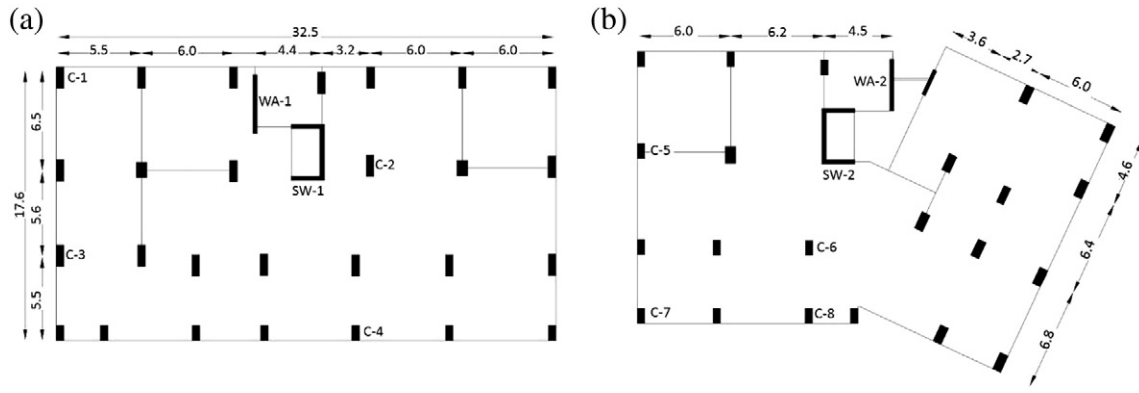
Geometry of building structure. (a): building 1, (b): building 2.
